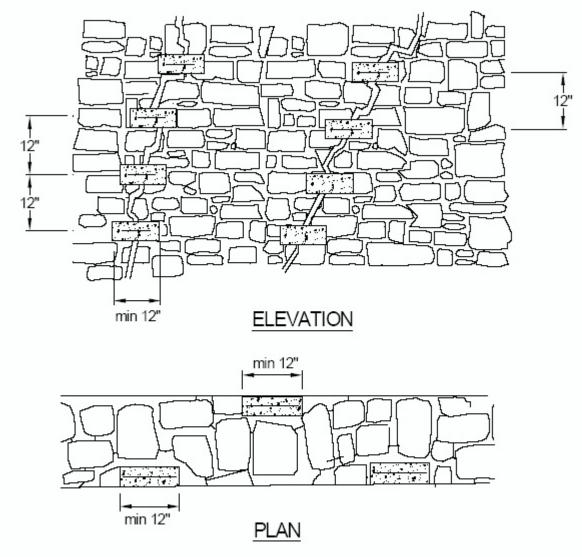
Repair of inclined cracks in masonry walls
